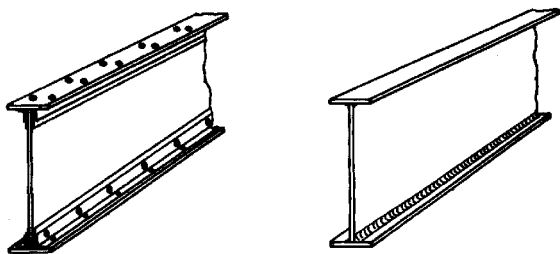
Built-up riveted beam (left) and welded beam (right).
